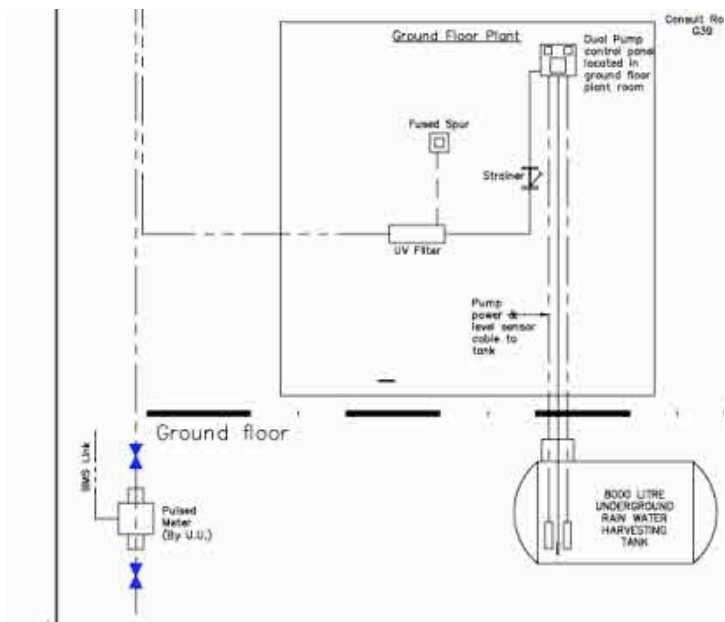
Rainwater harvesting system schematic, below plant room level
